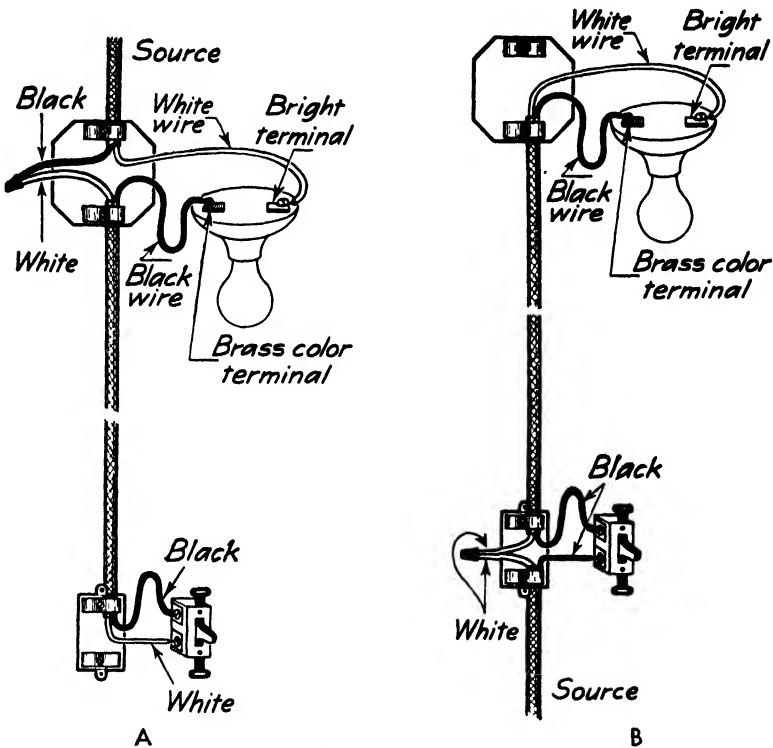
Installing a fixture controlled by a wall switch. A, fixture located between the source and the switch. B, switch located between the source and the fixture.
